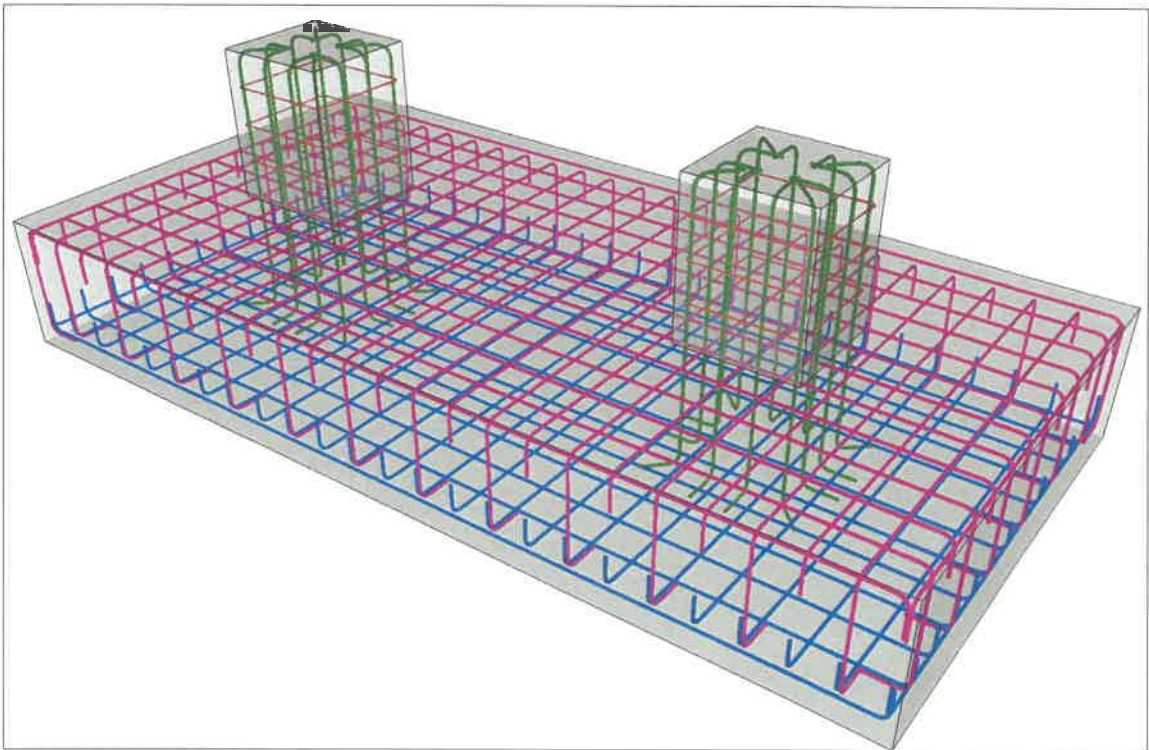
3D Model of a Reinforced Concrete Base and Stub Columns
